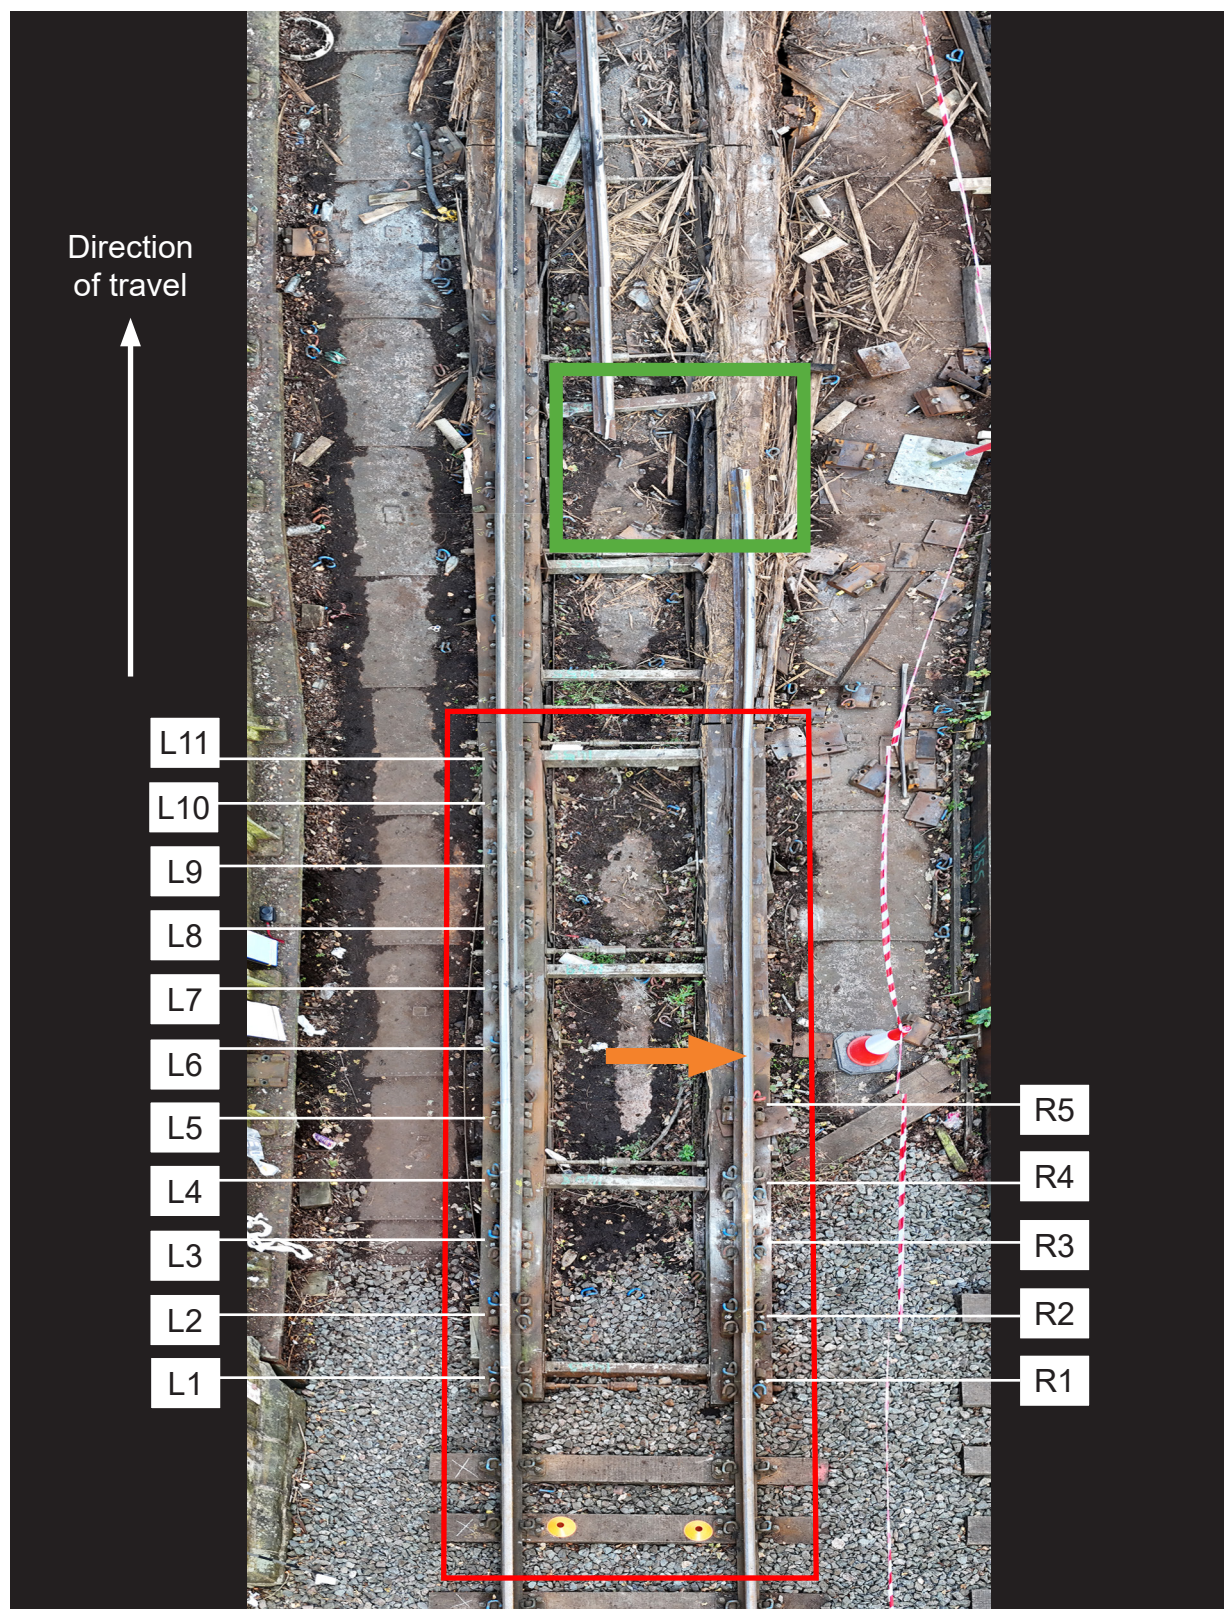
Area of the LBS showing the point of derailment (arrow) and the location of the broken rail welded joint (green box). The red box indicates the track section that was removed from site for the detailed examinations. (Note: all baseplates beyond R5 were displaced during the derailment).
